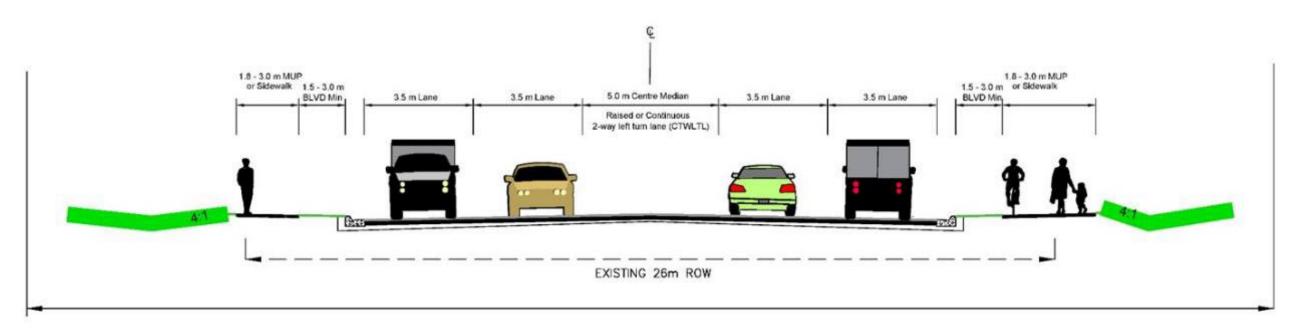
Section 1 Alternative 3 – 4-Lane Urban Cross Section
